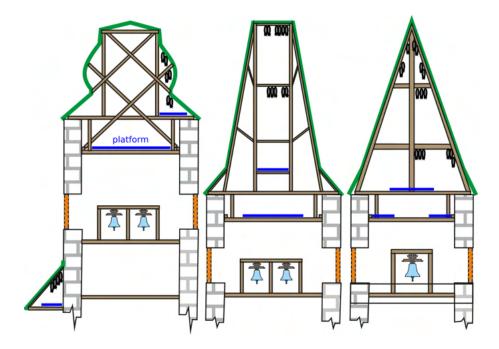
Several model examples of how to place the platform in different types of truss constructions in the tower.
